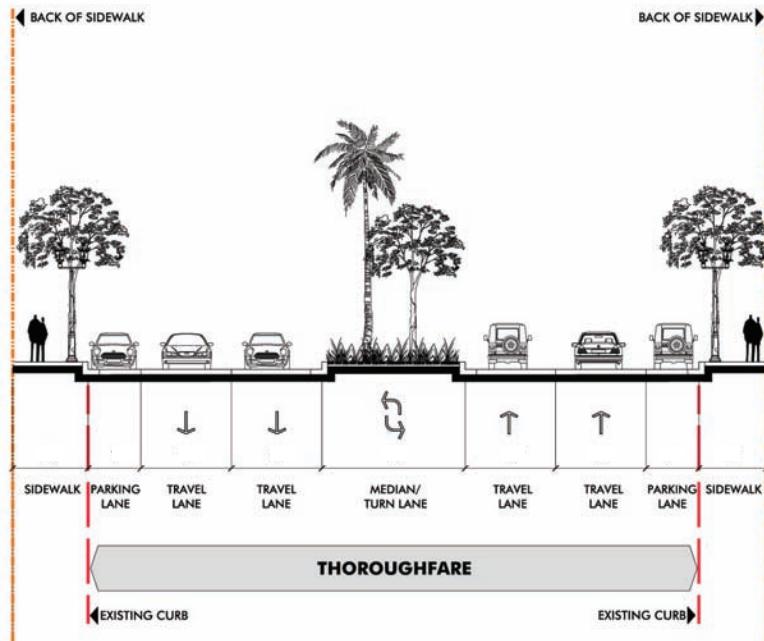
C.4: POTENTIAL CONCEPT STREET SECTIONS
